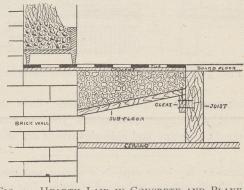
HEARTH LAID IN CONCRETE AND PLANK.
